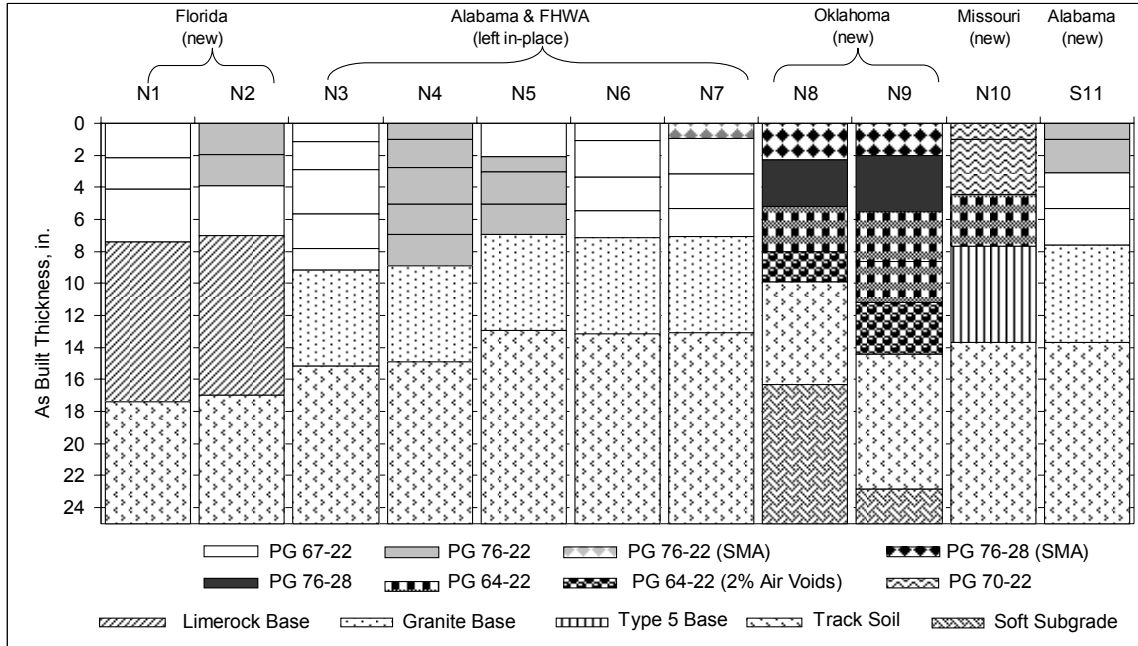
As-Built Cross-Sections for the Structural Sections at the Test Track.
